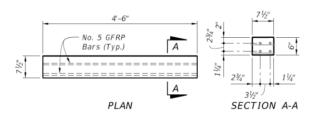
Configuration of the gravity wall test blocks (1 in. = 25.4 mm; 1 ft = 204.8 mm)
